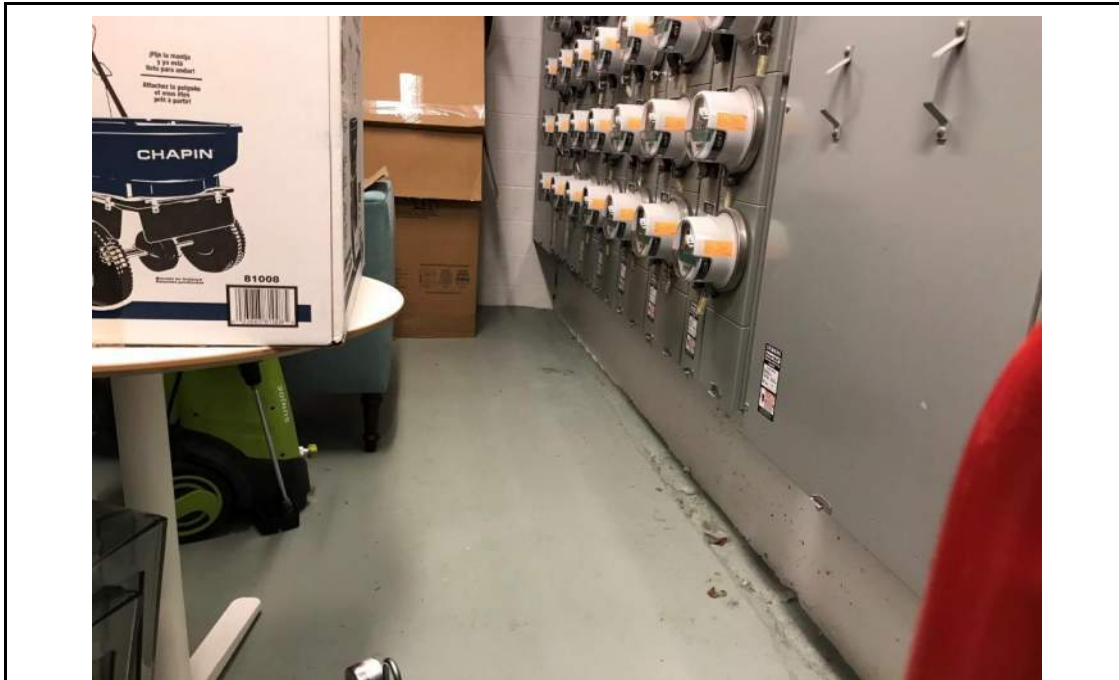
First floor concrete slab in electrical room in the southeastern portion of the building, facing west. 21 April 2021.
